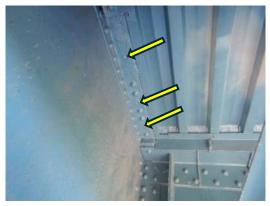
W-001: 3 popped rivet heads on top flange on FB0 between Right Girder and RS1, looking north
